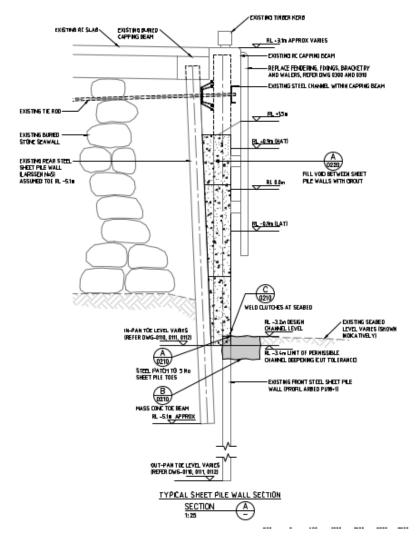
Cross section showing proposed Pier Stabilisation Works
